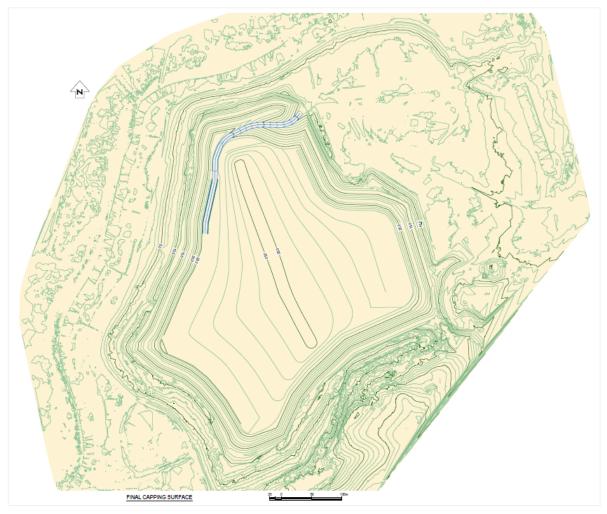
Plan showing the proposed final landform shape (top of capping), with new access road
